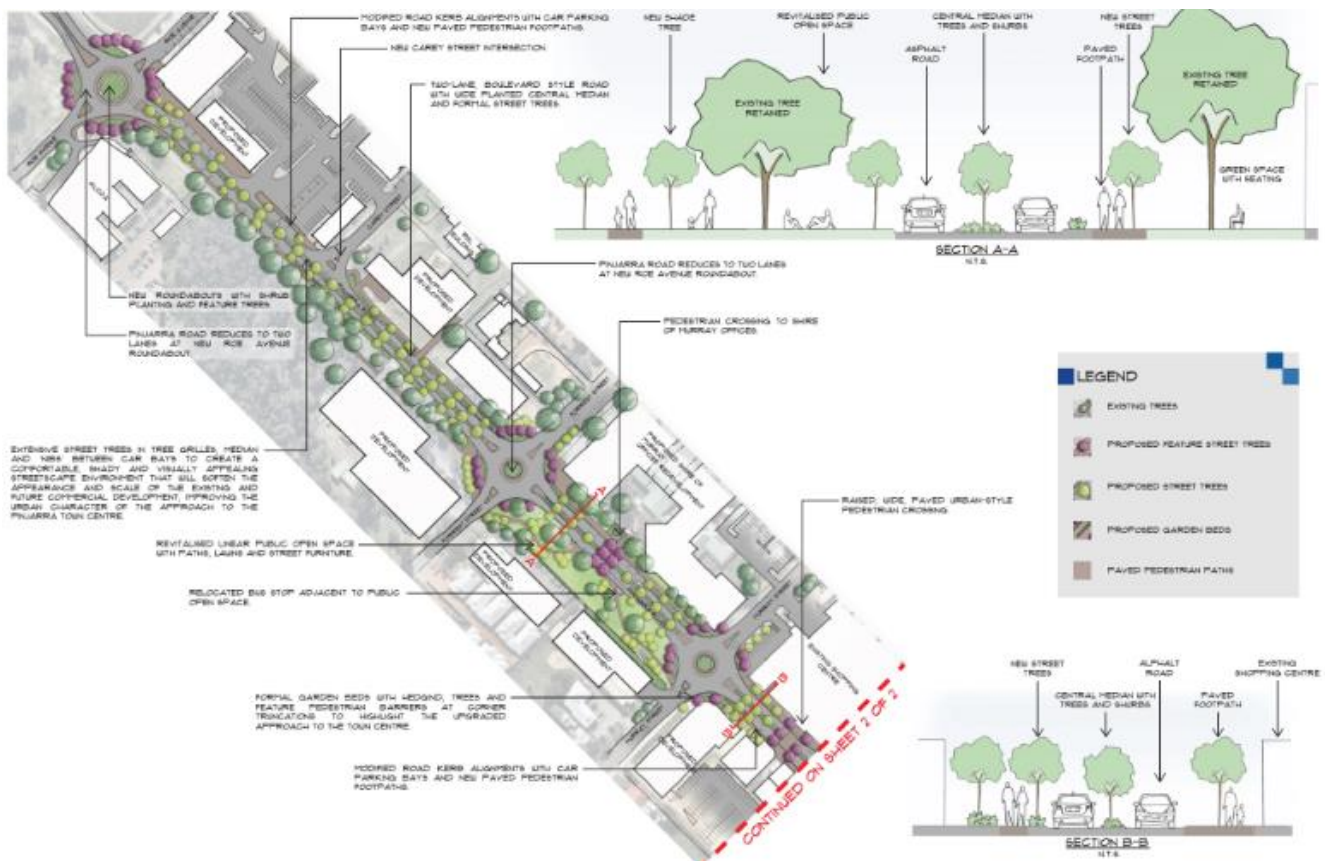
Pinjarra Road Streetscape Landscape Concept Masterplan – Pinjarra Road (source: Shire of Murray)
